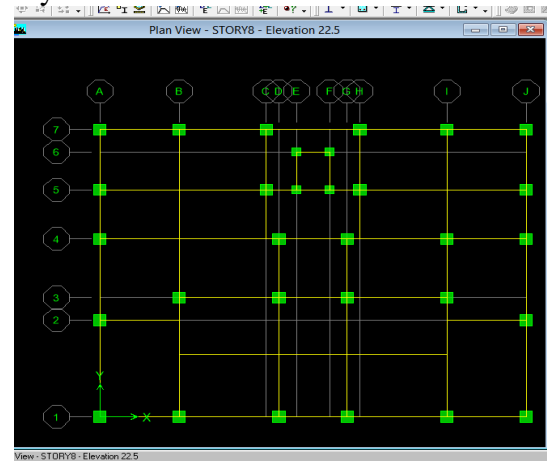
Columns from story 8 to story 12 for Plan of a building
